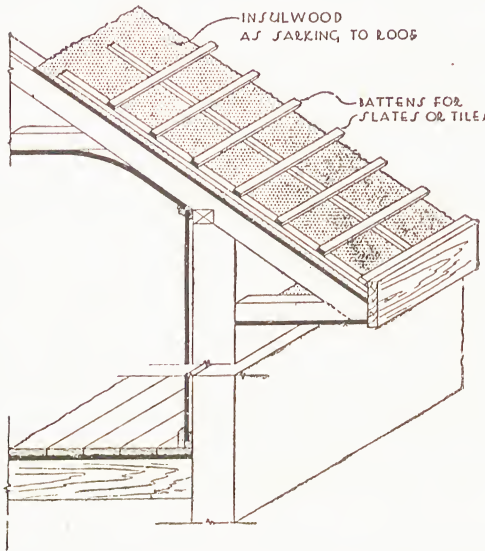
Method of insulating roof and floor with "Insulwood."
